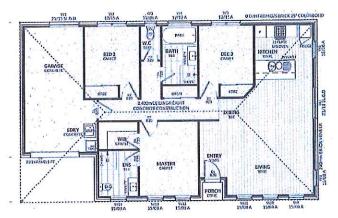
Proposed floor plan with roof shown dotted, as per application.
